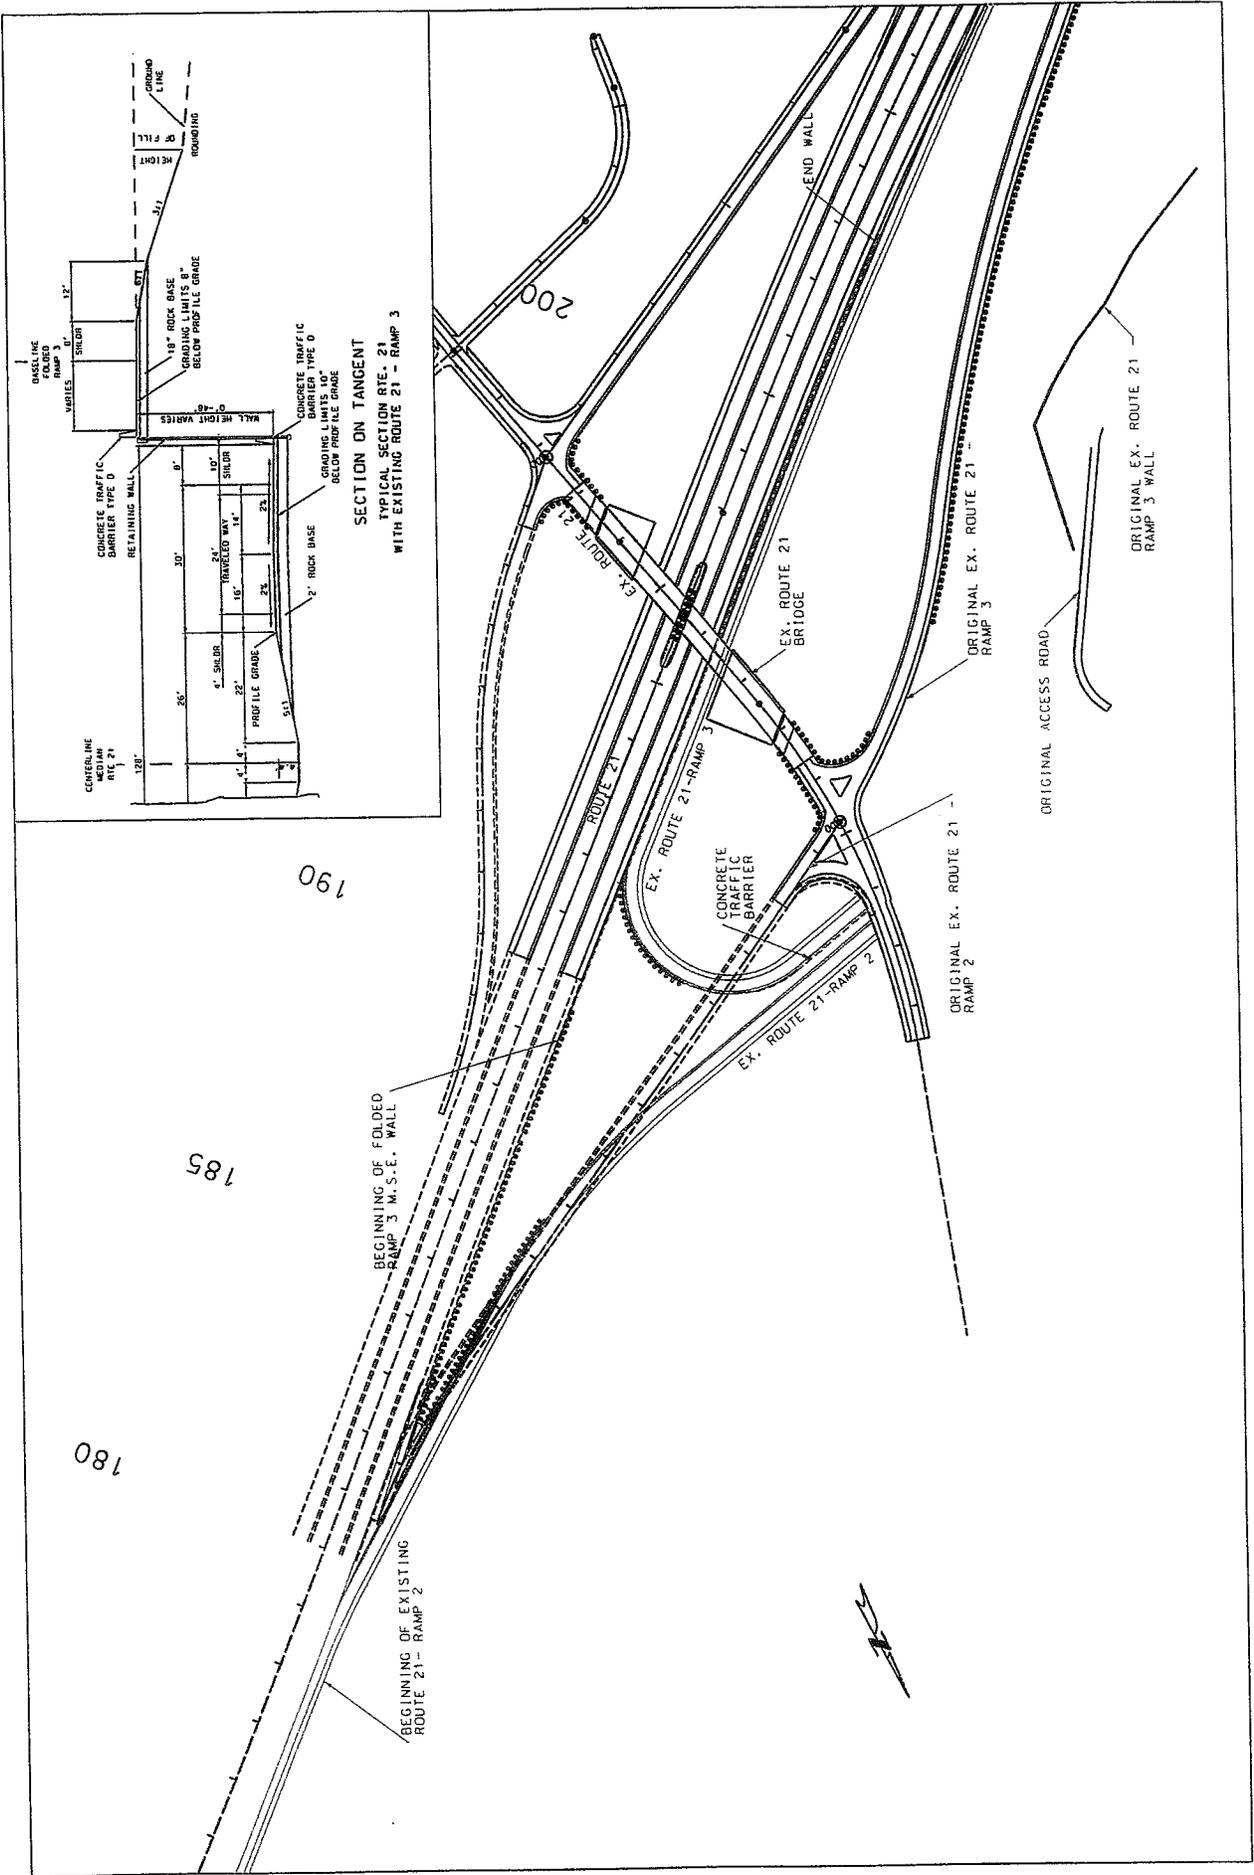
EXISTING ROUTE 21 - RAMPS 2 & 3 PLAN
